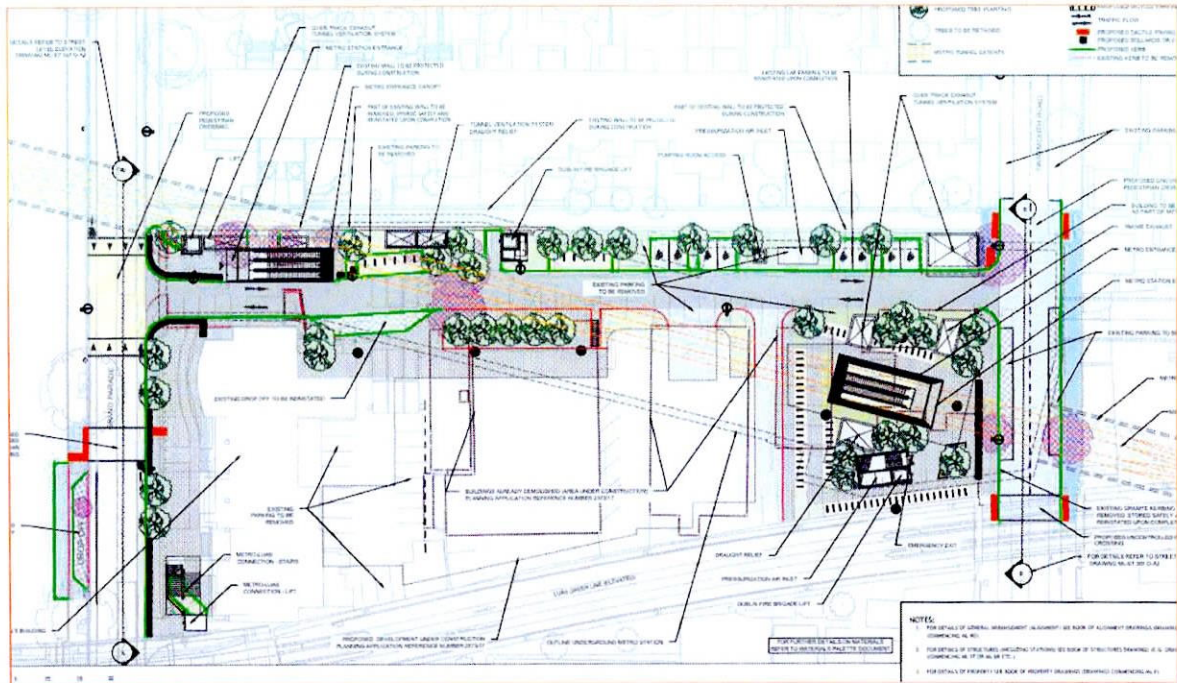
Location of Development Site – Metrolink Proposal – Charlemont Station
